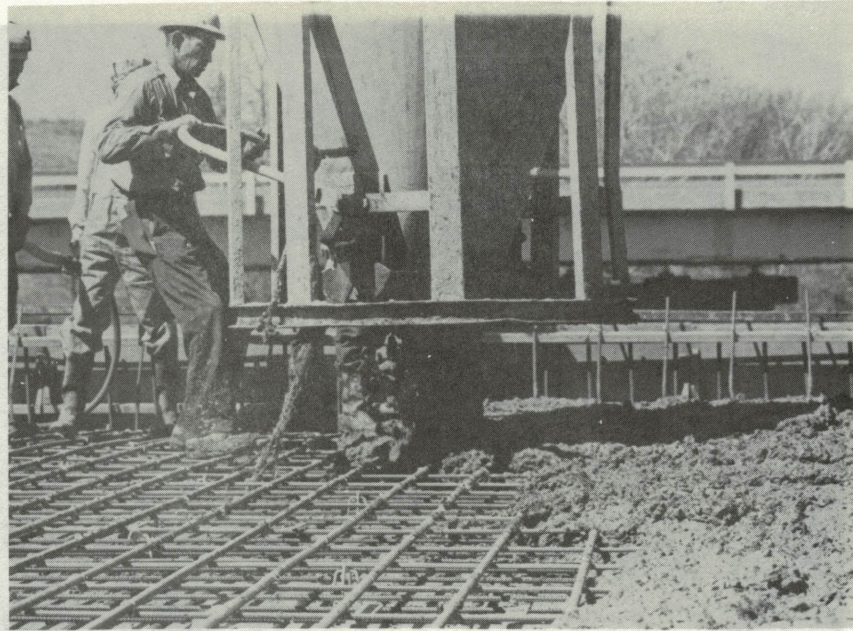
Bucket supported by an overhead crane pours concrete into the bridge deck grid.
